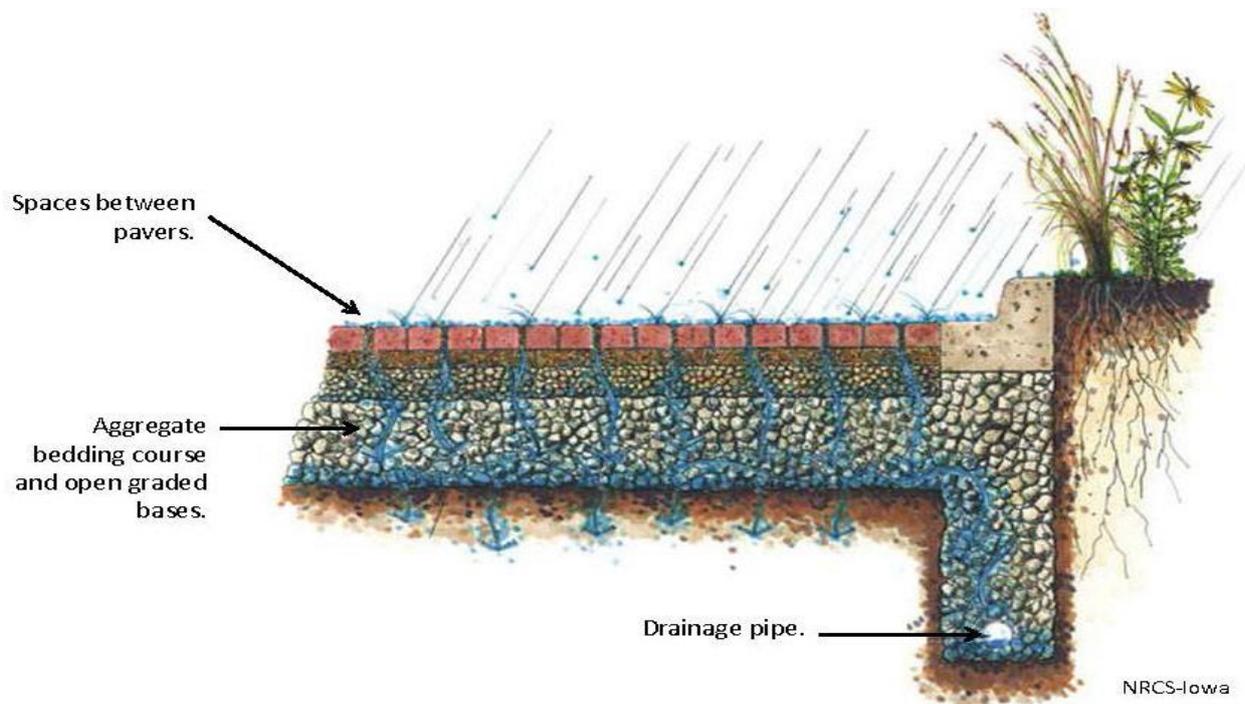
Permeable Concrete Paver Section (Source: [metrobloms.org](http://metrobloms.org), 2017).
